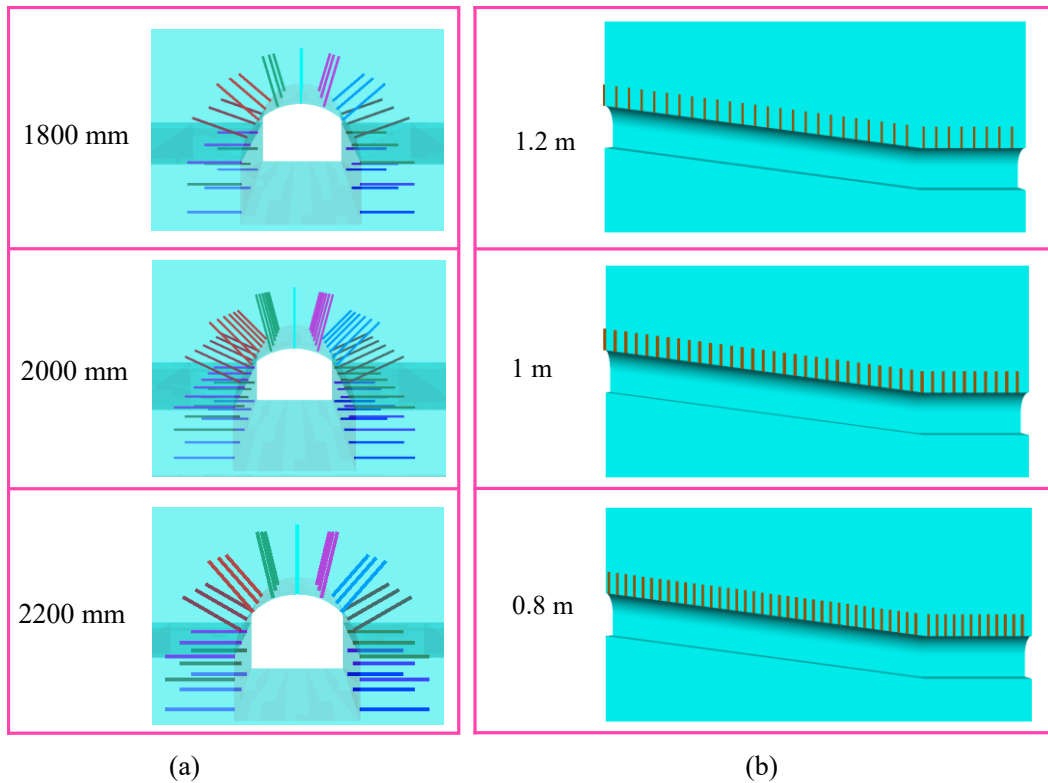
Bolt layout of tunnel under different bolt length and spacing schemes. (a) bolt length. (b) bolt spacing.
